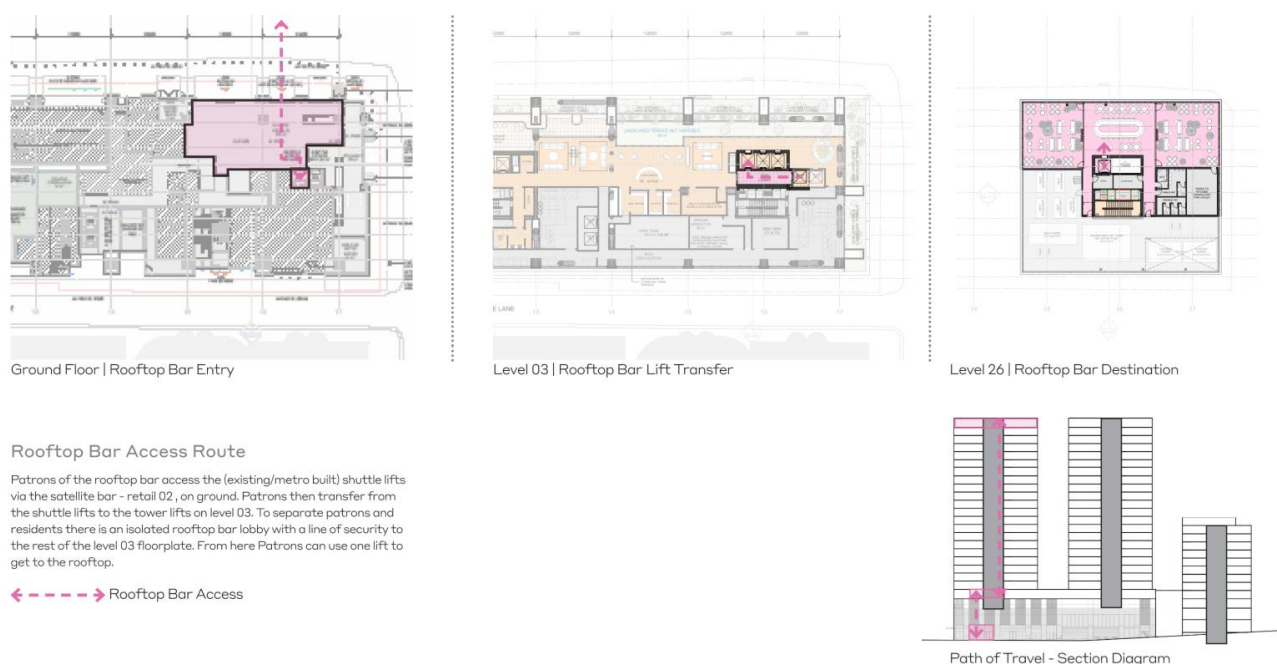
Rooftop Bar Access Route (Source: Woods Bagot)
